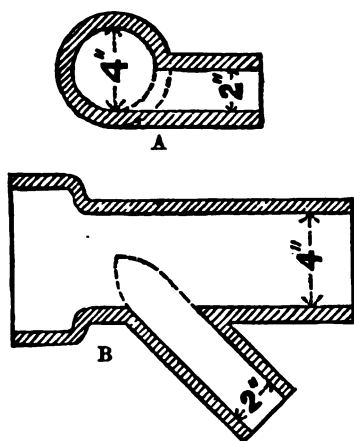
A, Section across Branch. B, Section lengthwise of Branch.
